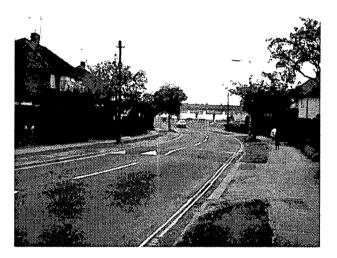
Western end of Mayfield Road looking west to roundabout with Fernhill Road
